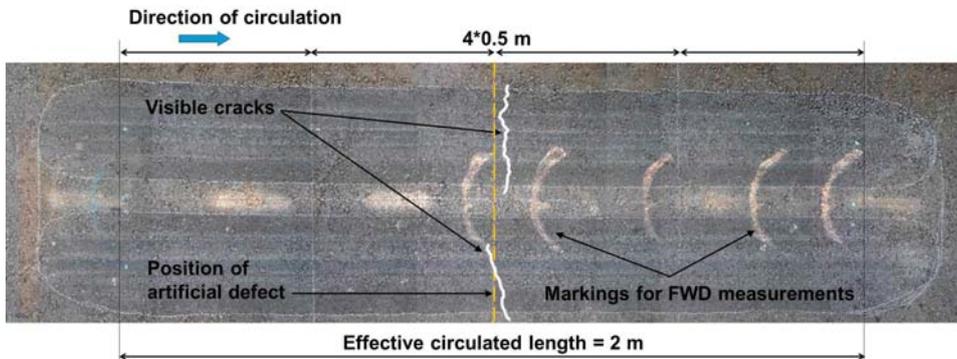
Top view picture of the pavement section after 1 million loading cycles: close-up of wheel path
